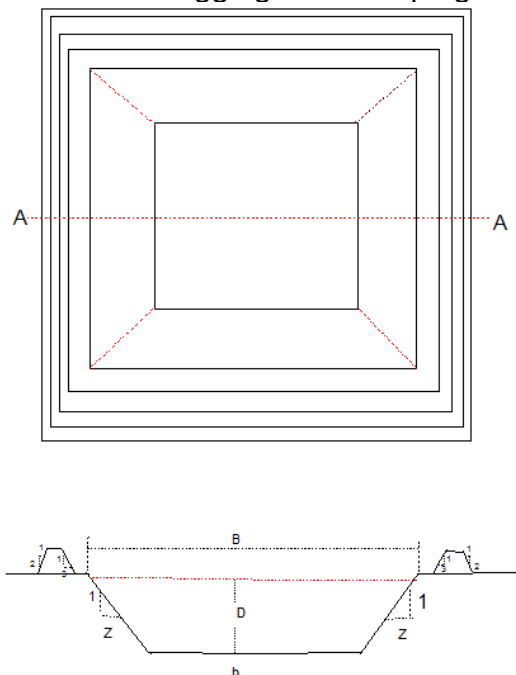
Plan and cross-sectional views of typical trapezoidal water pan.
